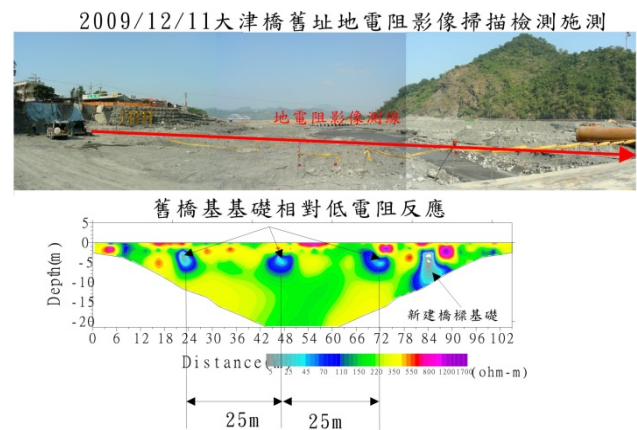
RIP investigating result of the existed pier foundations of Dajin Bridge
